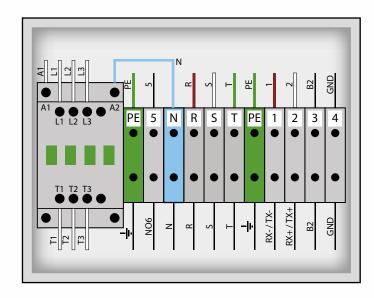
internal unit terminal block 3-PH, with auxiliary heater
